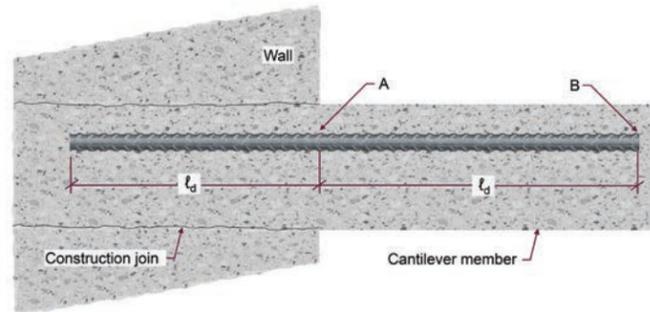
Development length of a reinforcing bar in a cantilever member. Source: Wight, James & MacGregor, James. Reinforced Concrete Mechanics & Design, 2012.
